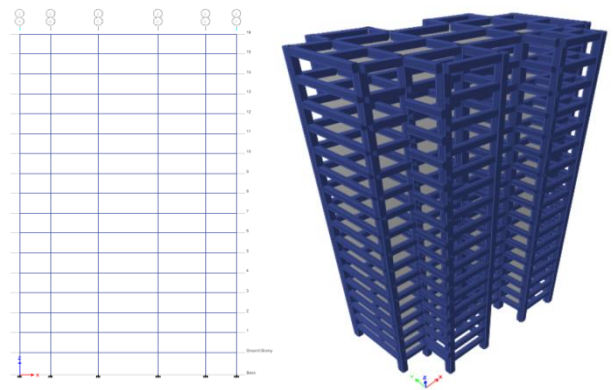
(b): Elevation and 3D view of (G+16) Normal R.C. Building model
